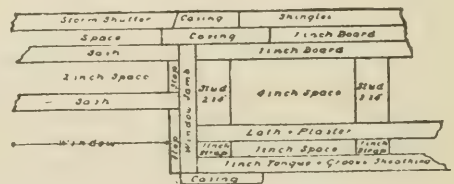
SECTION THROUGH WALL AND WINDOW.
